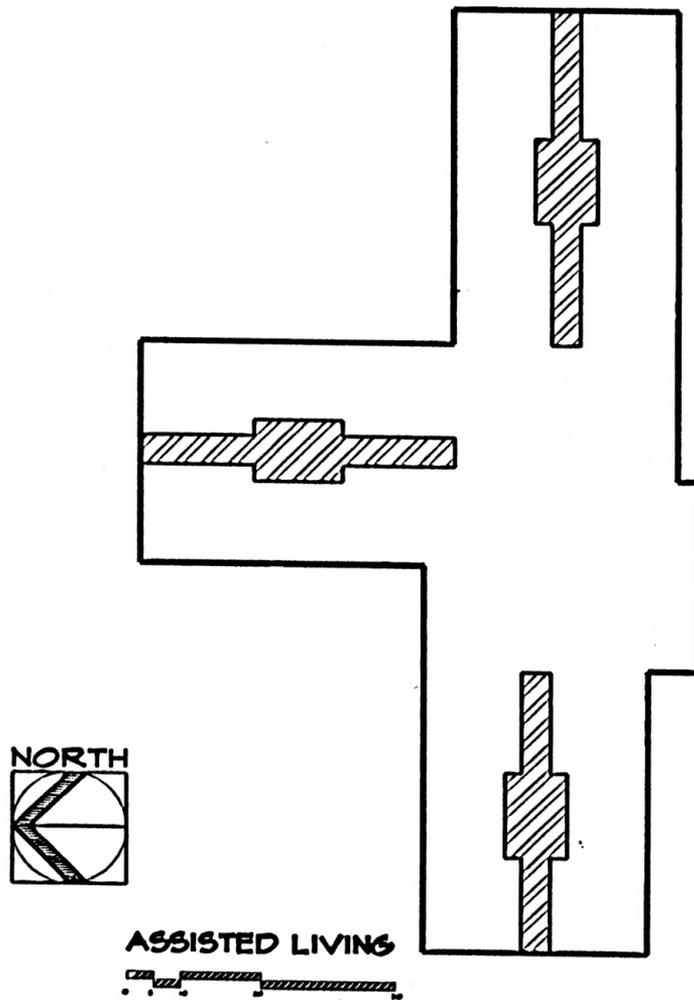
Plan of Assisted Living Hallways - Site 1.
